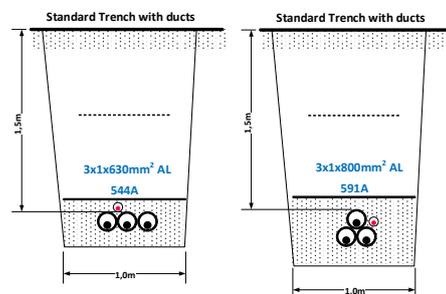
220kV Onshore Cable Trenches Typical Arrangement
